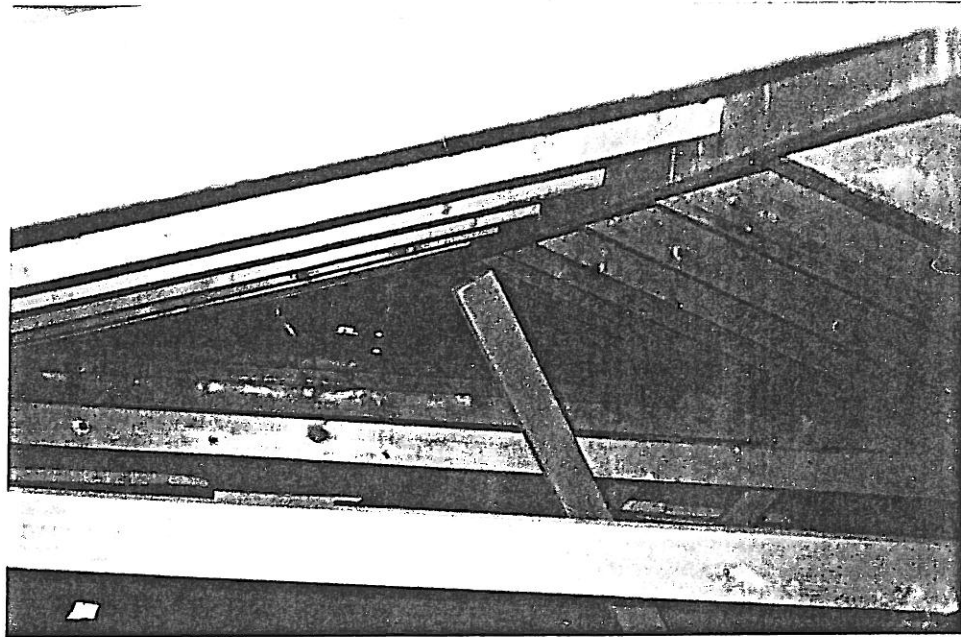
THE EXISTING ROOF SYSTEM LOCATED OVER THE HOUSE PORTION OF THE STRUCTURE.
